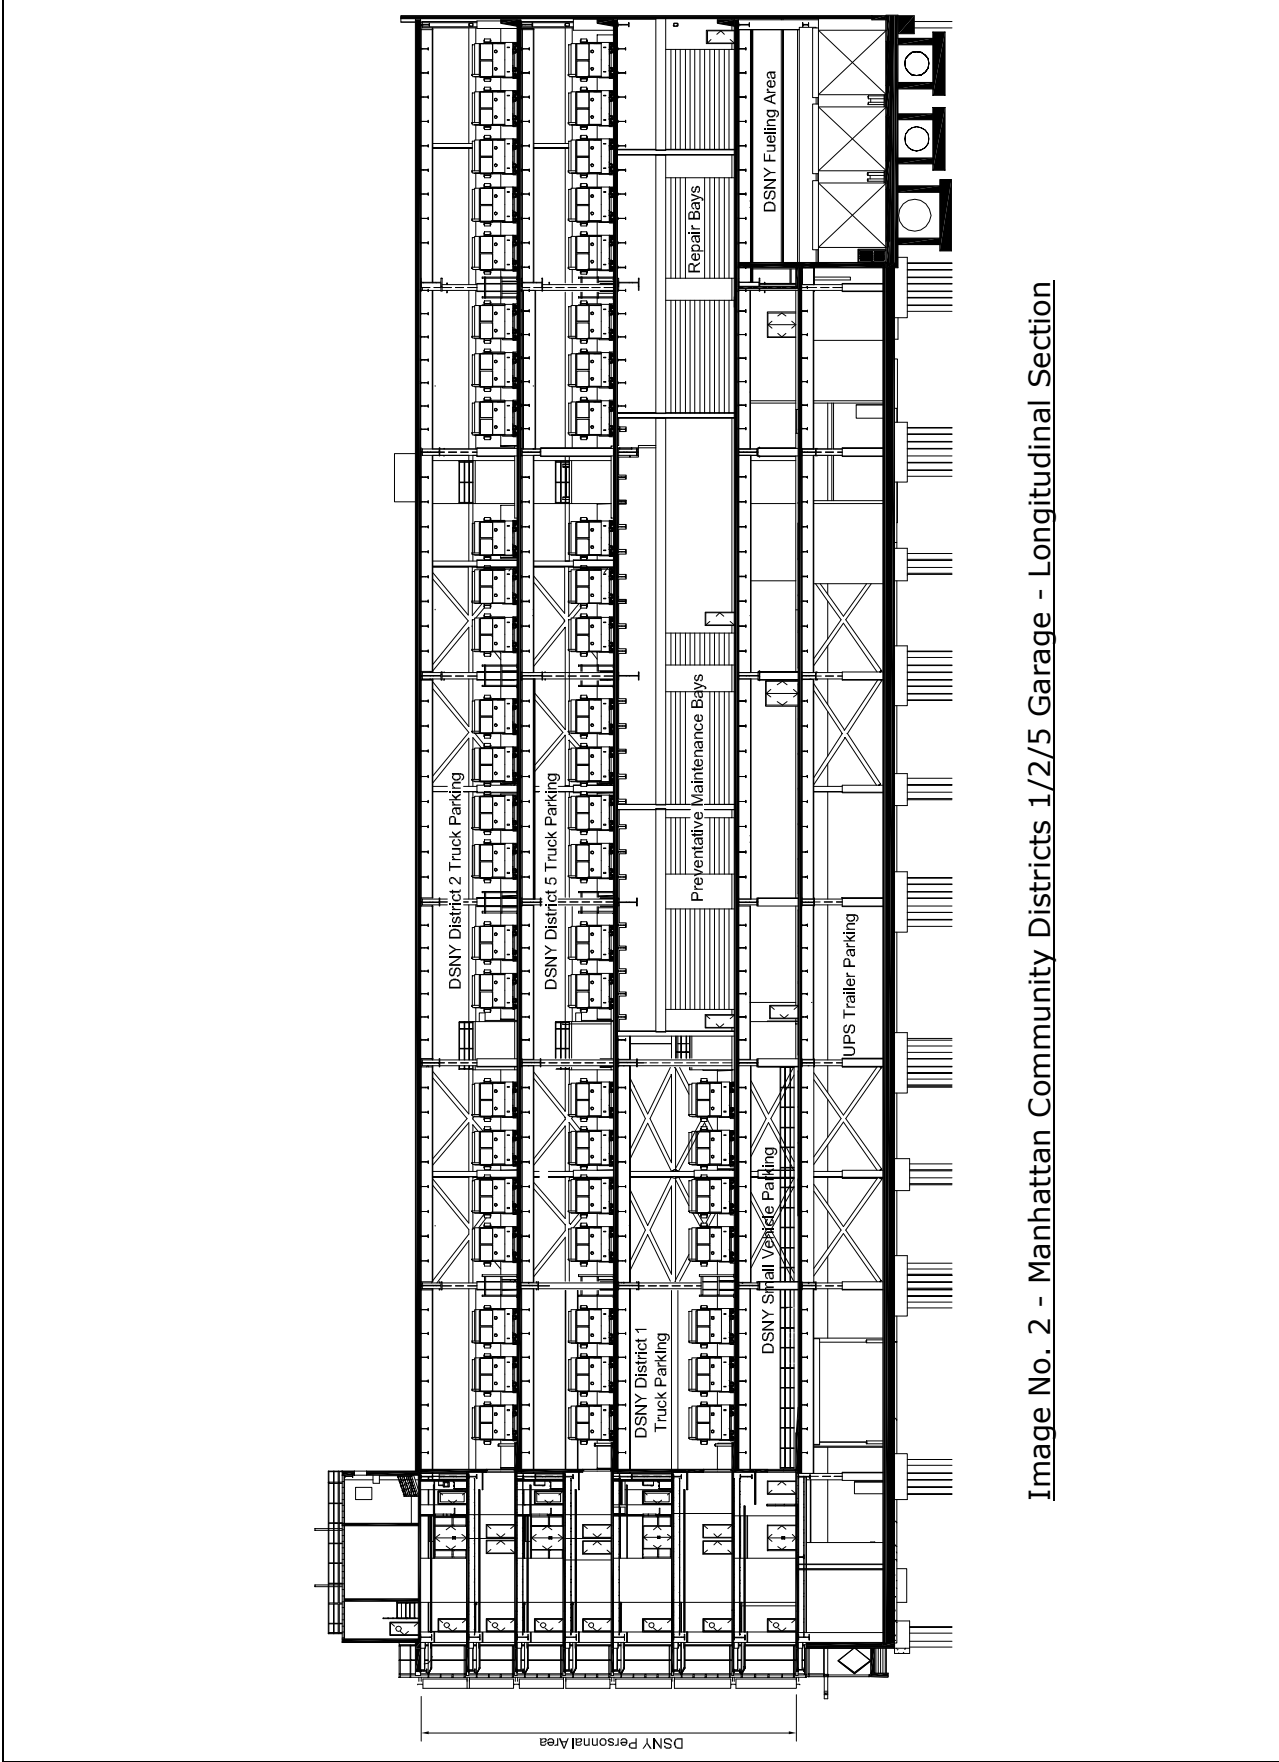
Manhattan Community Districts 1/2/5 Garage - Longitudinal Section
